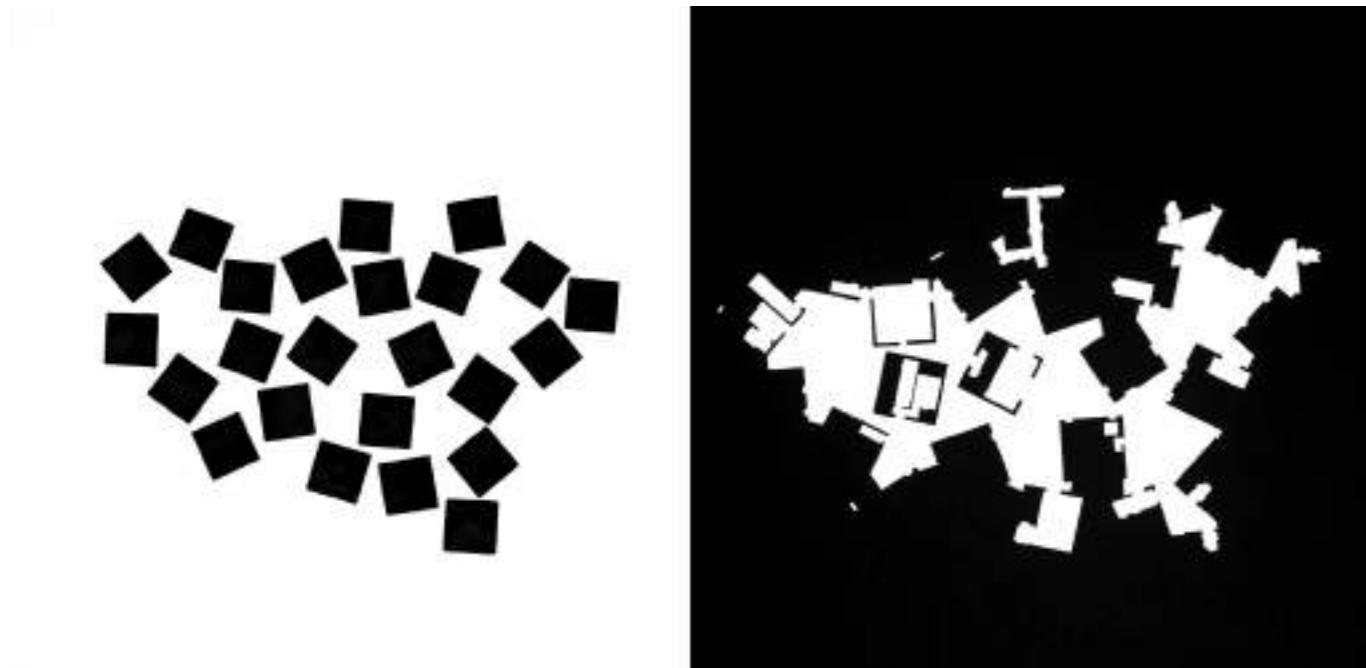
THE ABSENT PLAN. Figureground (left) and Figured plan (right), Children's Center, Hokkaido, 2006, Sou Fujimoto Architects, Master Studio Case Study drawings by Issa Driesen & Daan Vanbrabant, BUILTNOTHING I, 2022
